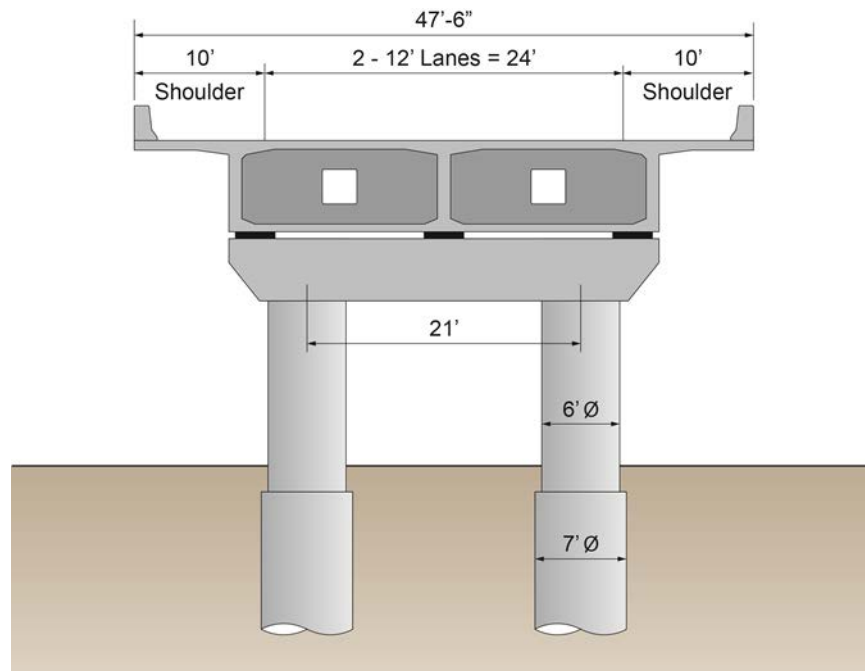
Cross Section of Design Example 2 Bridge at the Piers
